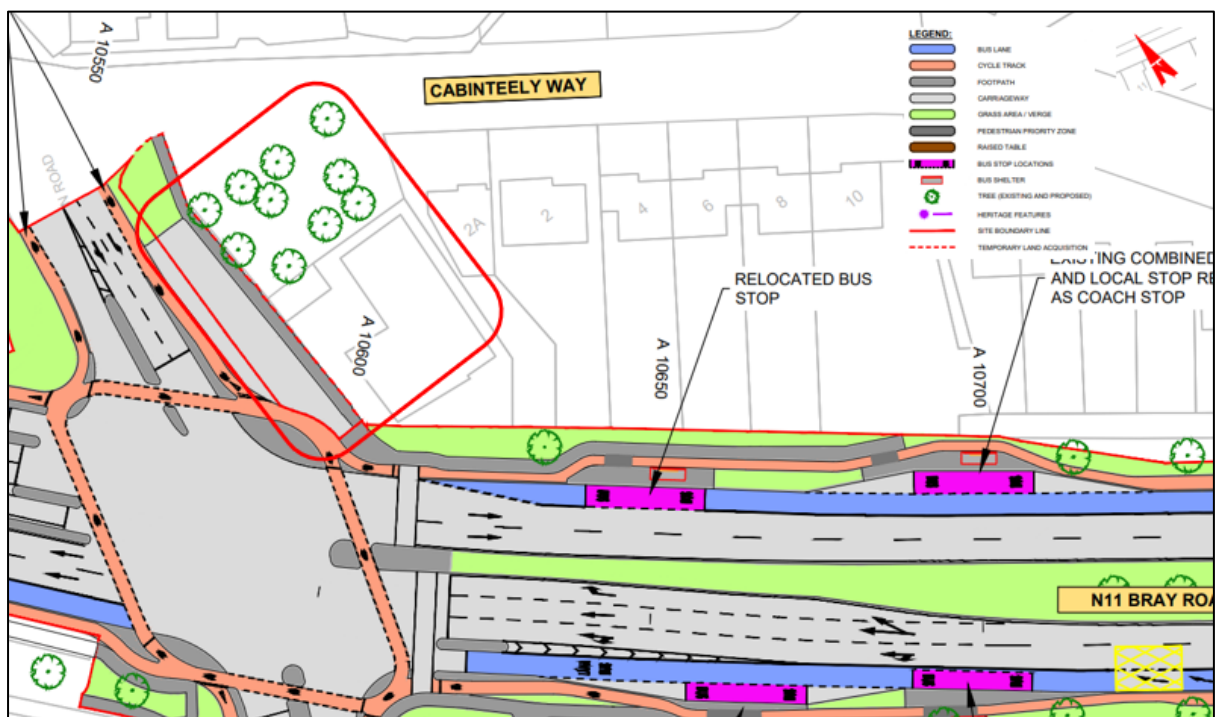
Extract from General Arrangement Drawing at Clonkeen Road (Sheet 31)
